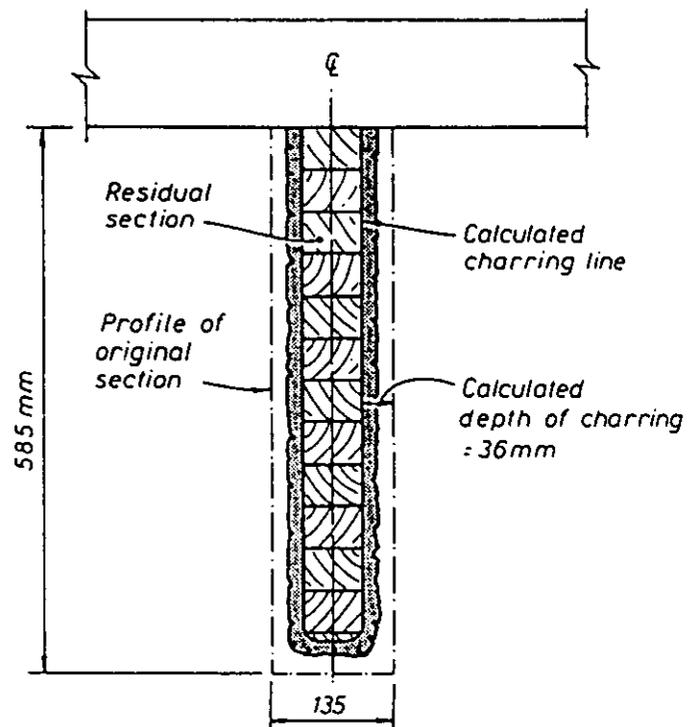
Cross-section of glulam beam before and after one hour of fire exposure.
